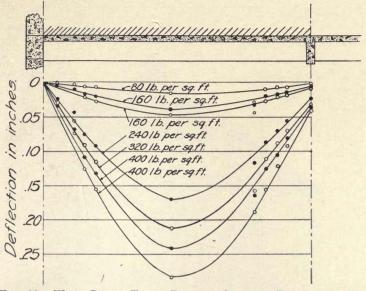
WALL PANEL TEST; DIAGRAM SHOWING DEFLECTION OF INTERMEDIATE BEAM.
